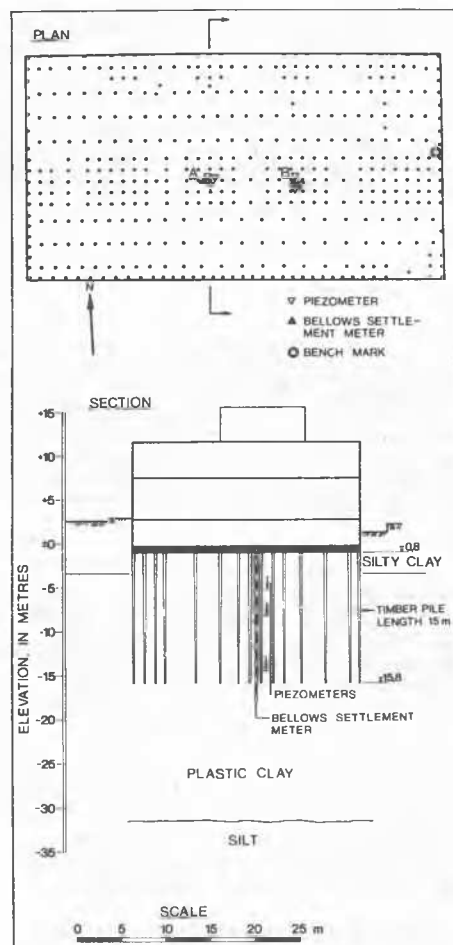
(right) Plan and cross section of building and the layout of piles and soil instrumentation.
